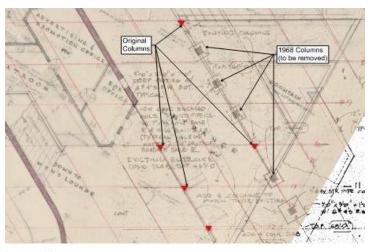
Overlay of original building and 1968 plans showing original exterior columns enclosed within lobby addition
